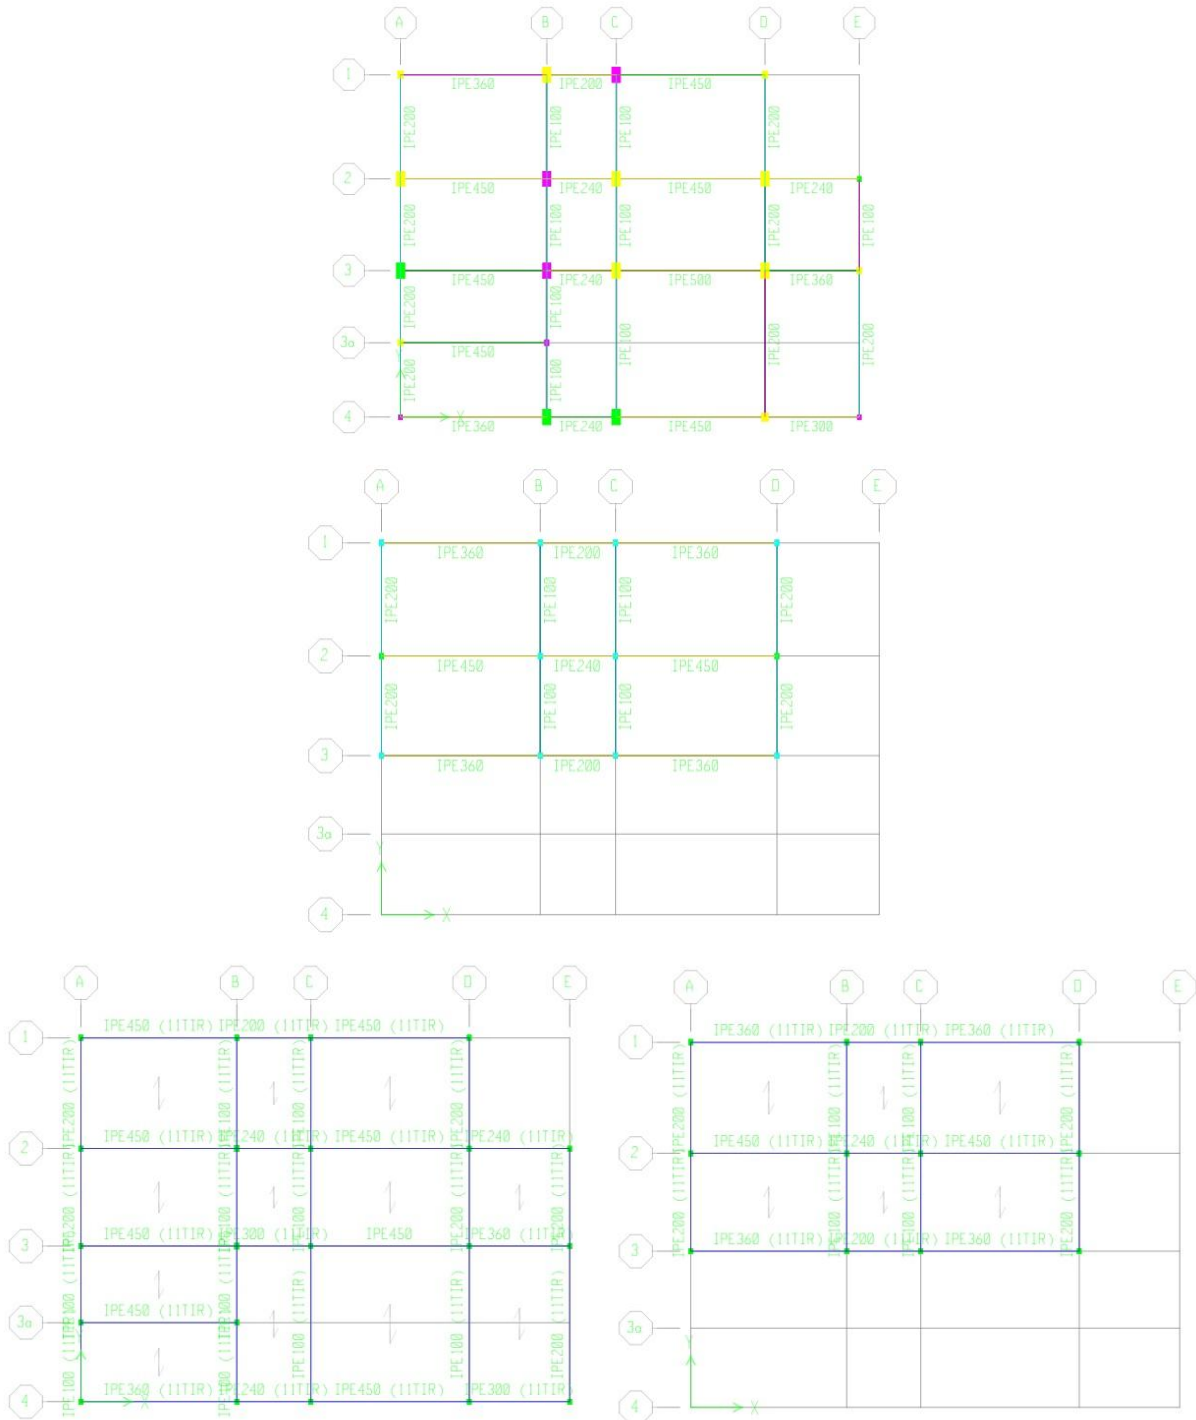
35. Selected beams and secondary beams direction in roof and floor plans
